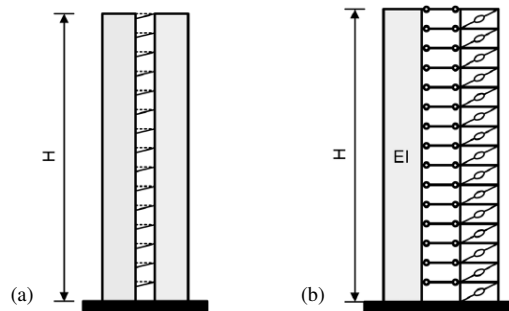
FVDs coupling adjacent shear walls (a) wall dissipative bracings set in parallel (b) as proposed by Lavan 2012
